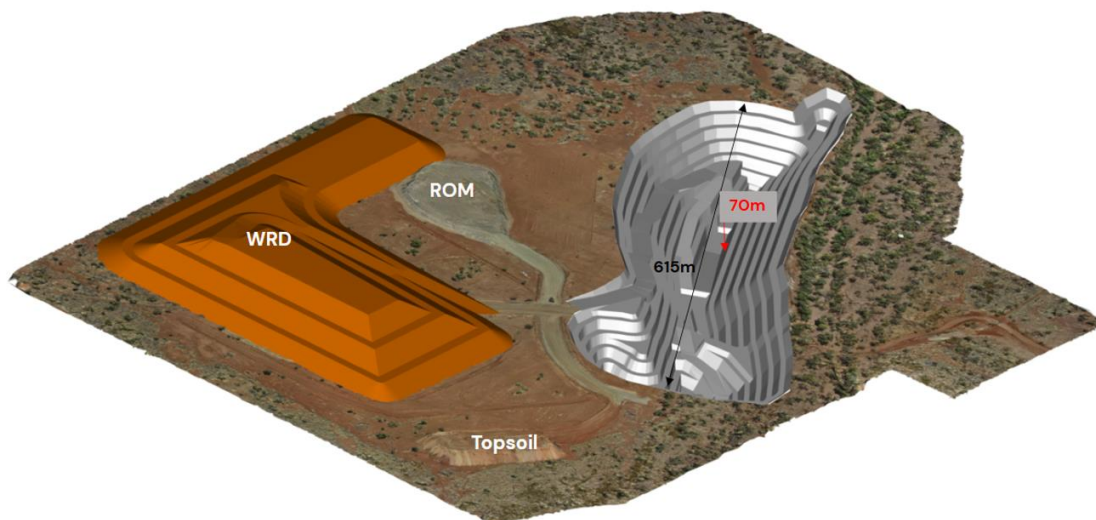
Wallace North Stage 2 pit and waste rock dump design at 15 m bench heights (isometric view looking north-east)
